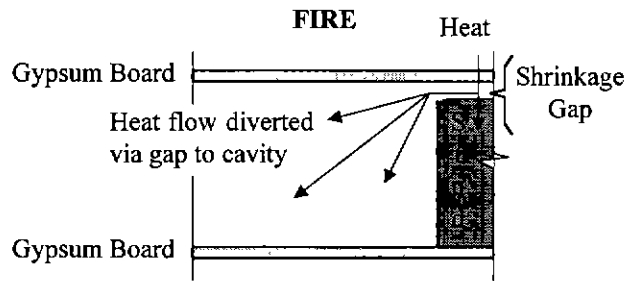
Part Horizontal Section through Ordinary Hollow Cavity Wall showing Diversion of Heat via Gap to Cavity.
